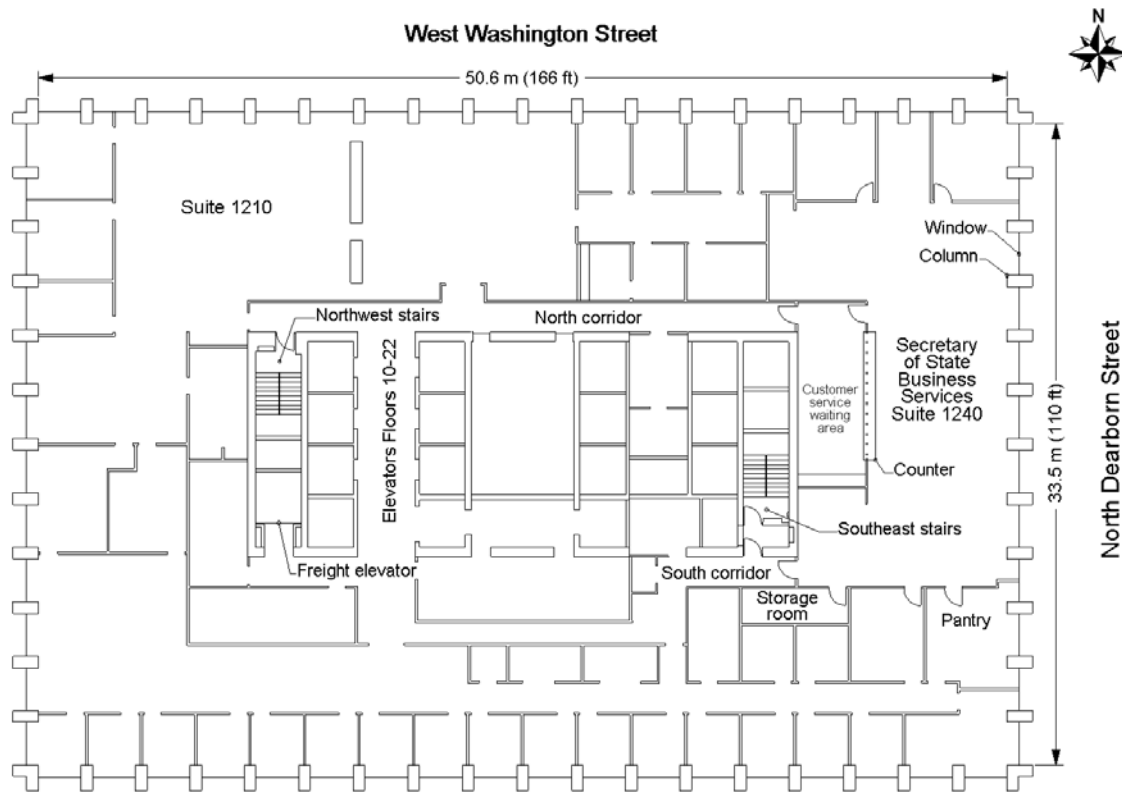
Plan view of the 12th floor of the Cook County Administration Building
